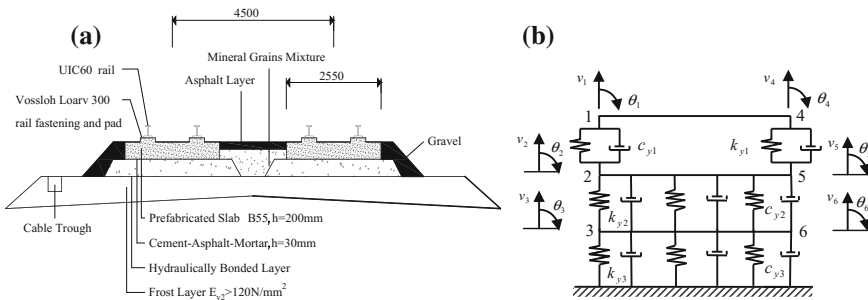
Three-layer slab track element model. a Cross section of the slab track and b three-layer slab track element
